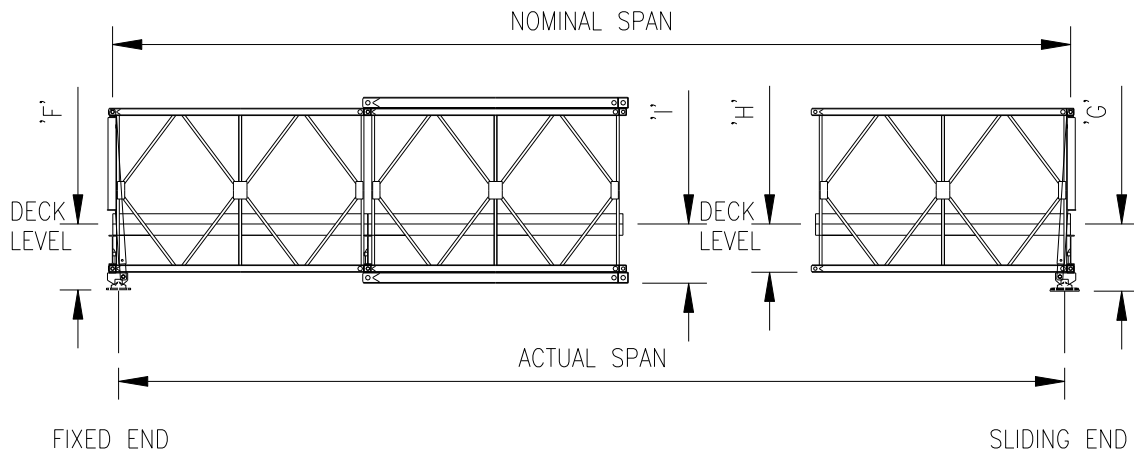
TYPICAL LONGITUDINAL AND VERTICAL DIMENSIONS
